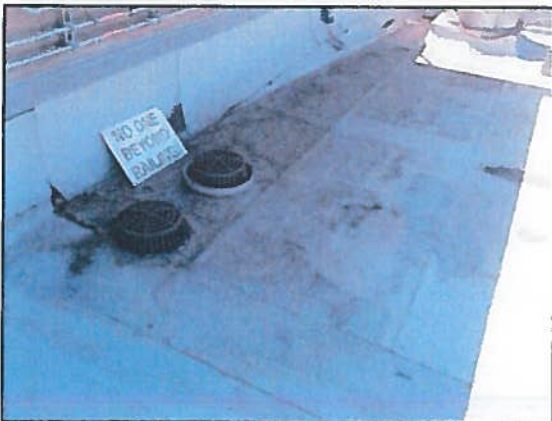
Maintenance Facility – Damaged roof membrane around drains
